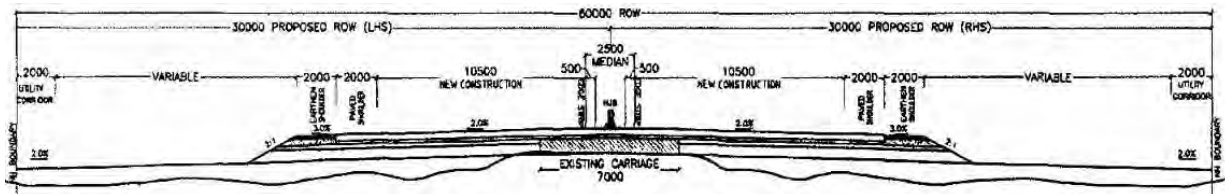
Typical Cross Section for concentric widening without service road (TCS-14)
